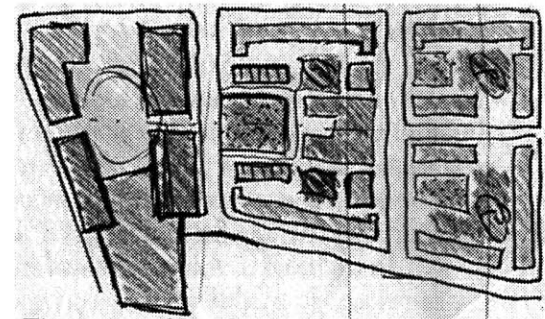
Sketch site plan. Uses Hope VI block plan to organize site. Preparation for second site model pass. Proposes parking structure over Corridor.
